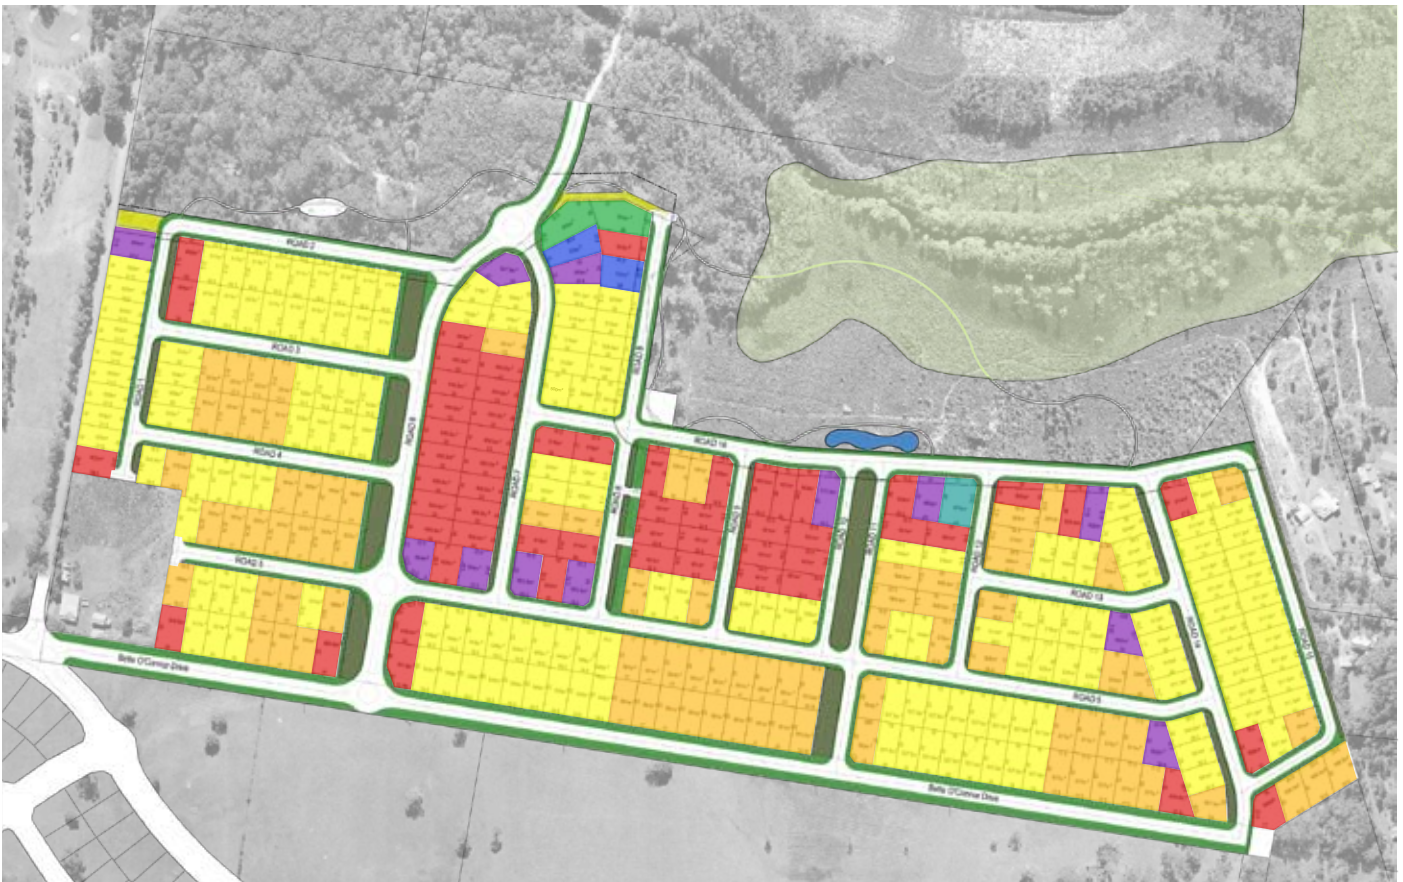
LOT SIZE PLAN SEE APPENDIX G FOR FULL SCALE PLAN
